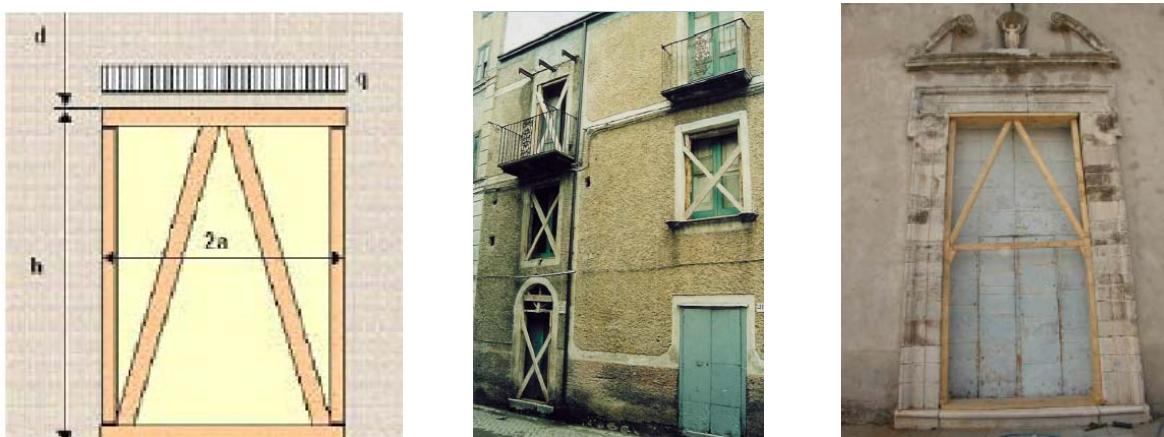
Propping and bracing door and window openings (SSN-DPC, 2005)
